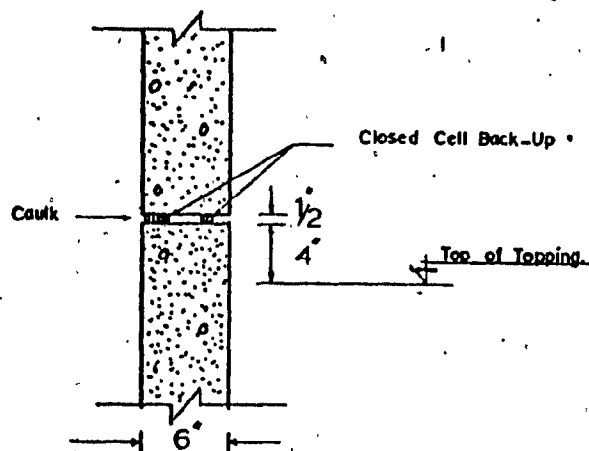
Typical Connection Details. Typical Panel Connections
